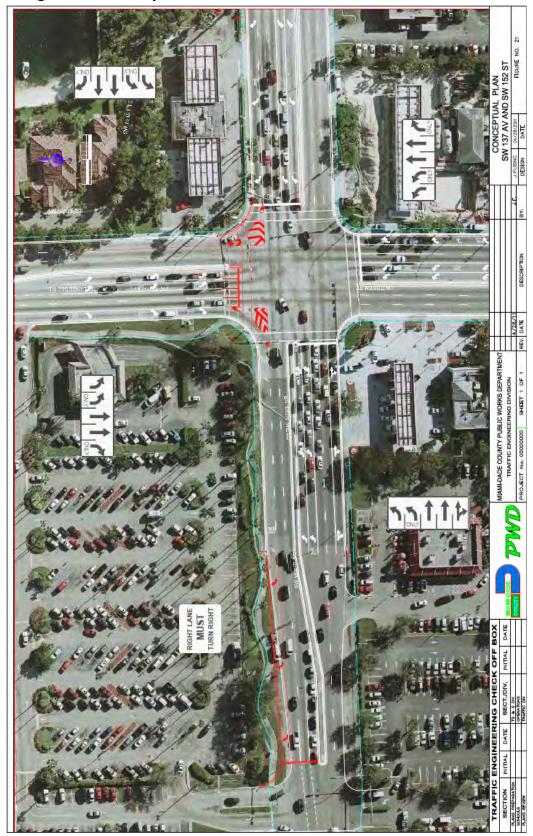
Conceptual Plan – SW 137 Avenue and SW 152 Street
